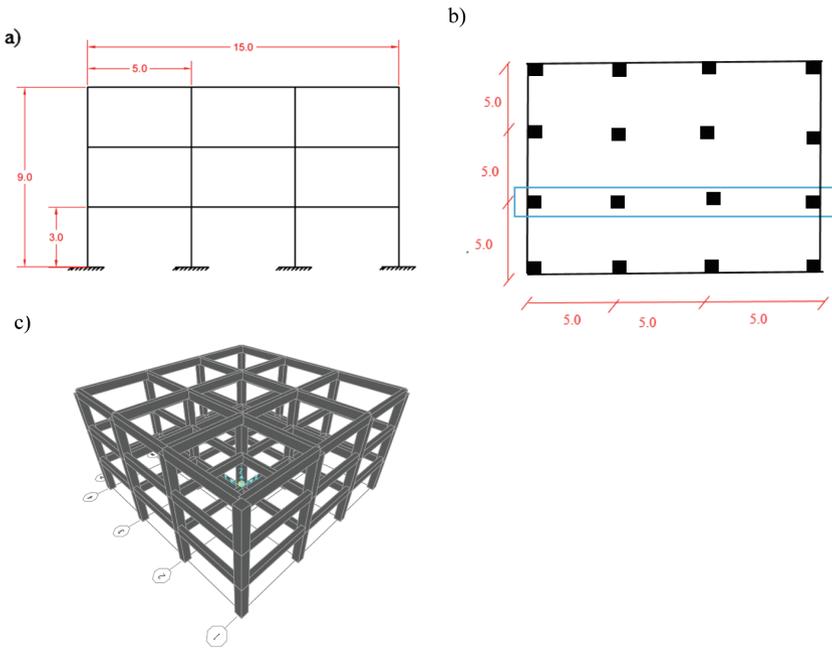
For the 3 storey building (a) Elevation. (b) Plan. (c) Isometric view.
